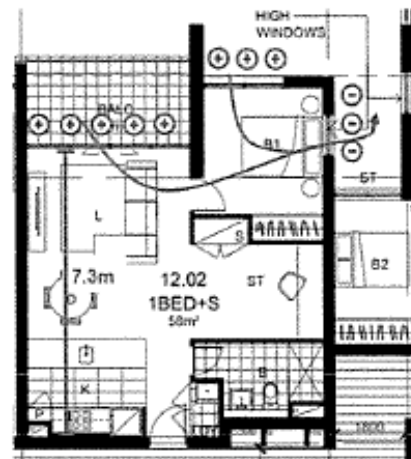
Typical cross ventilation details for units 1.02 (and above) and 13.02.
